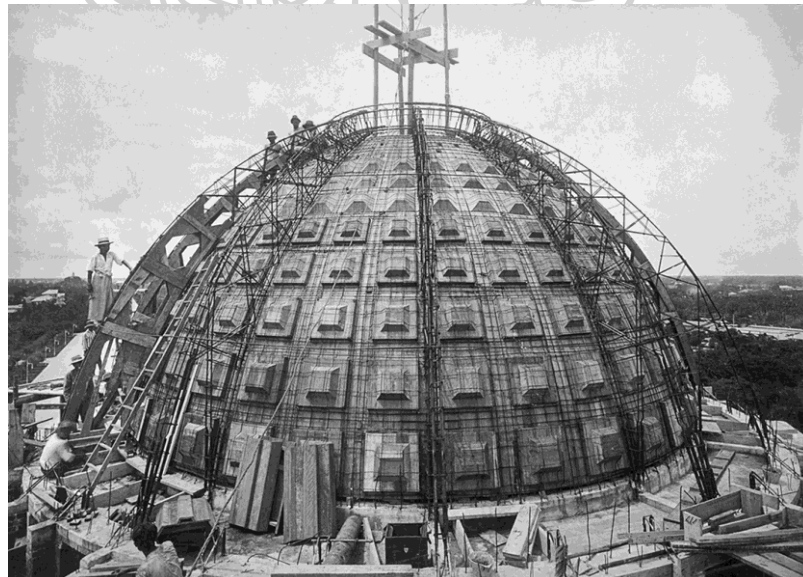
Reinforced-concrete dome of Ananta Samakhom Throne Hall under construction, late 1909.
